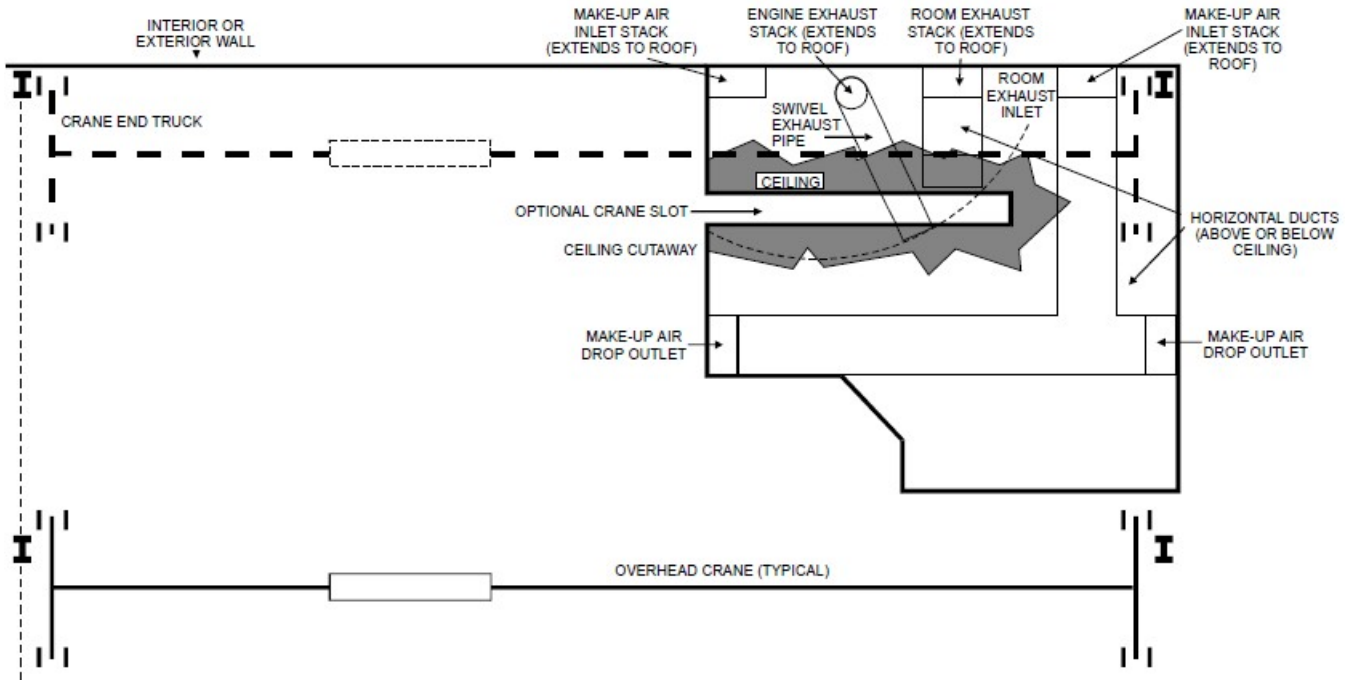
Overhead Crane Exhaust Stack Layout 1
